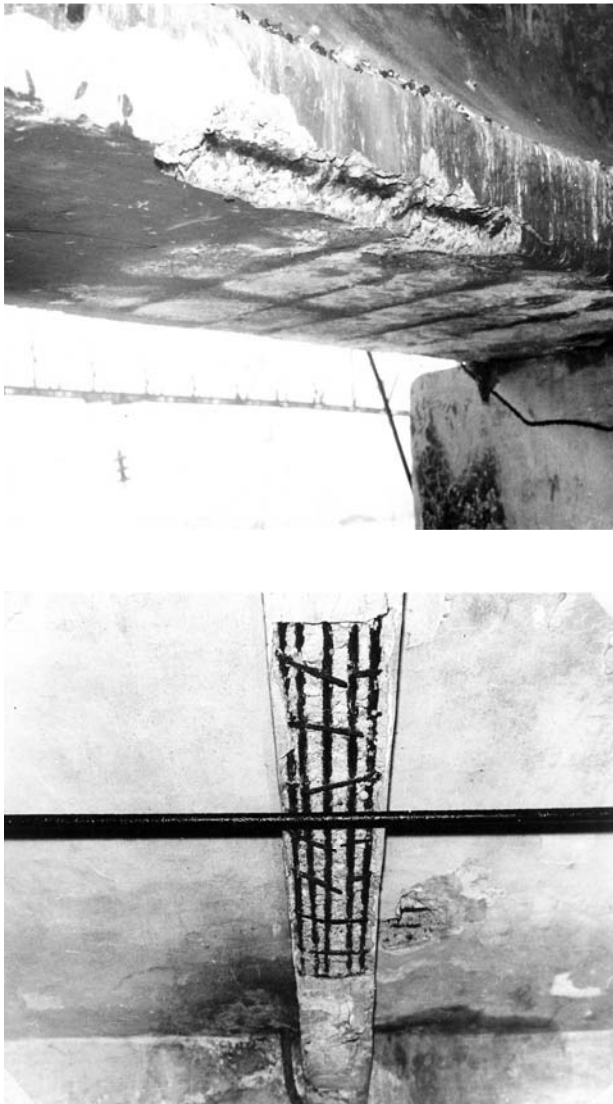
Bridge reinforced concrete girder (top) and floor beam of industrial building (bottom) in service with corroding reinforcement
